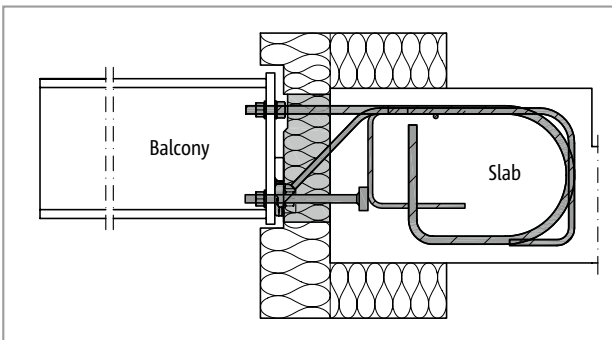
Schöck Isokorb® T type SK-M1: Special design based on the lateral force load ranges M1
